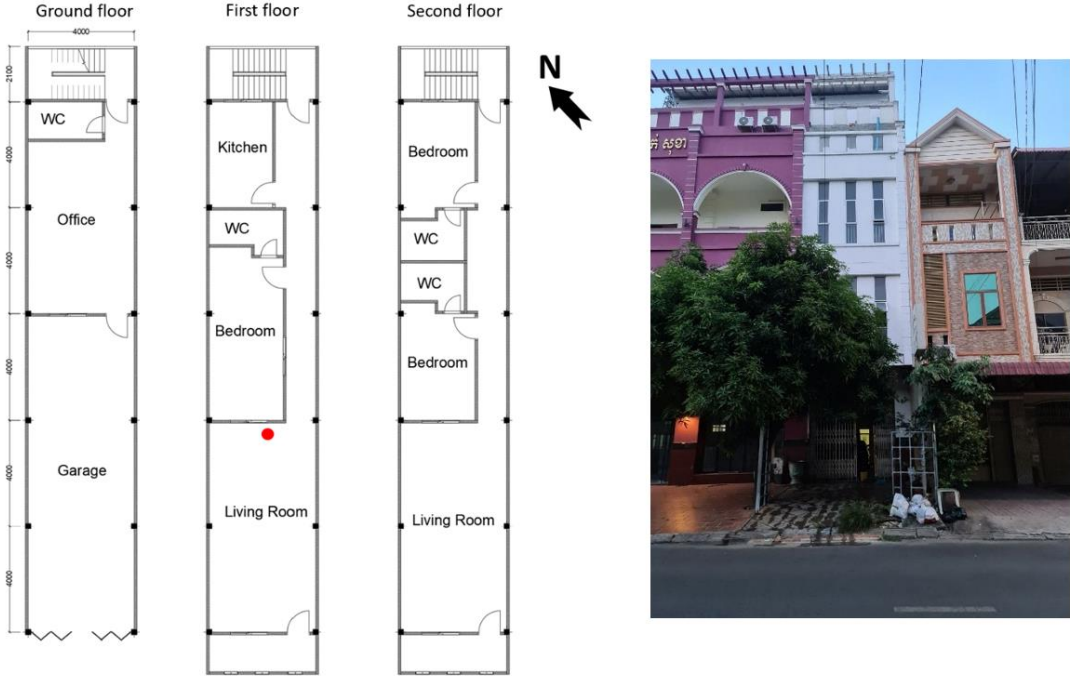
Floor plan and the surroundings of building T1 (the red dot is where the sensor was installed).
